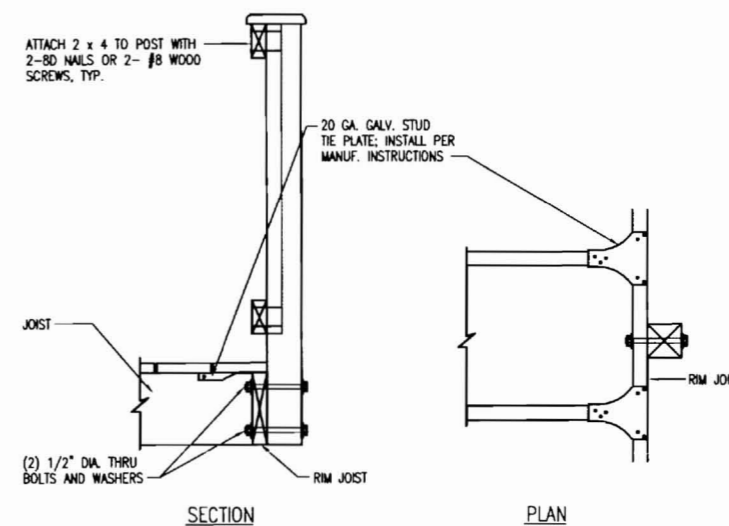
GUARD POST TO RIM JOIST DETAIL - OPTION 2
